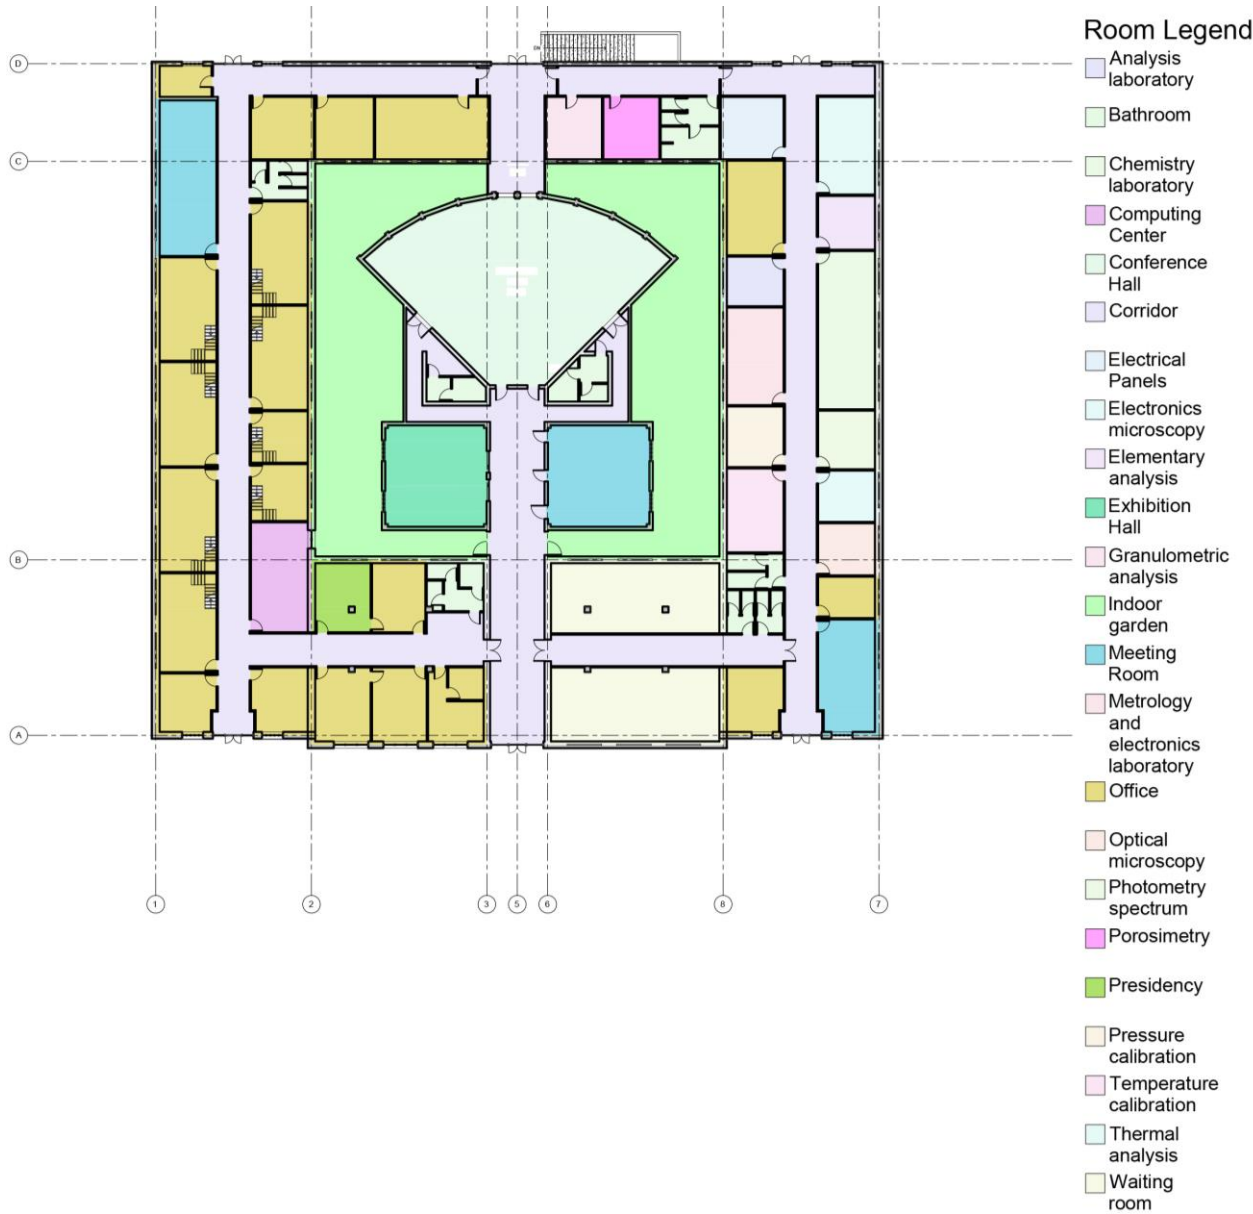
Sotacarbo Research Center – Ground floor plan with room uses.
